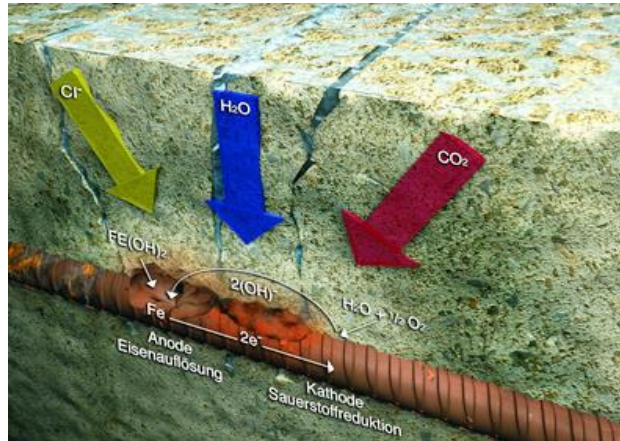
Corrosion process (“Building Facades – Spalling Concrete?” n.d.)
